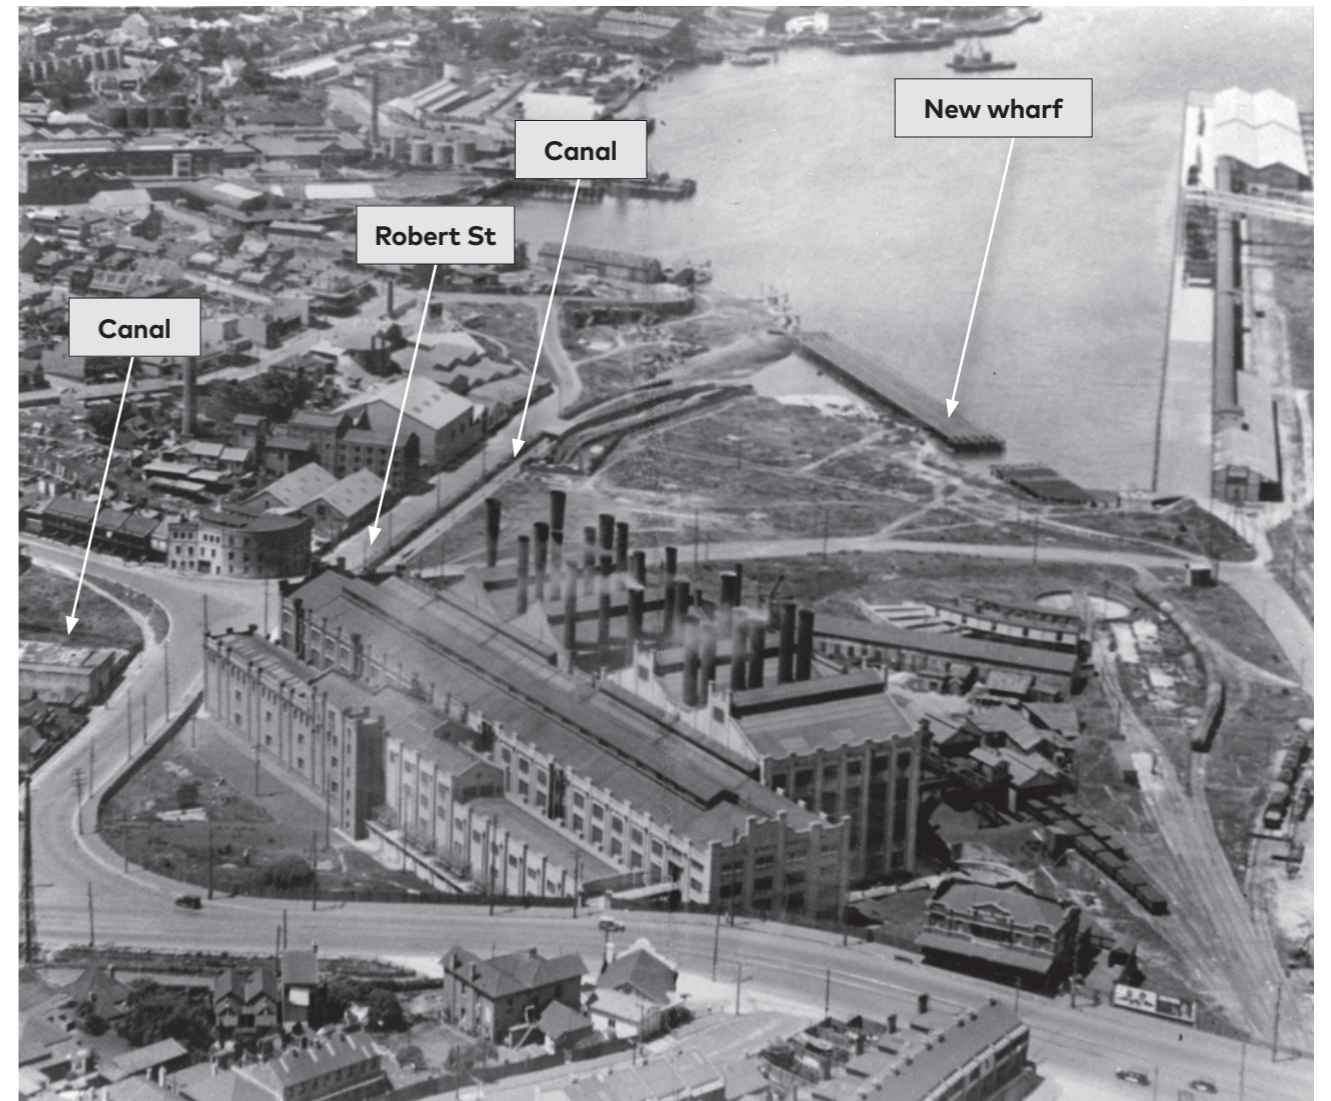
1930s view of White Bay Power Station showing the construction of new wharfs, location of stormwater canal and reclaimed land south of Robert Street.
